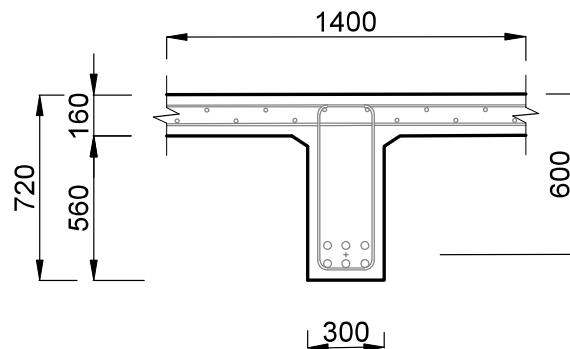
T-beam dimensions with reinforcement detail identical to tested beams [mm].
